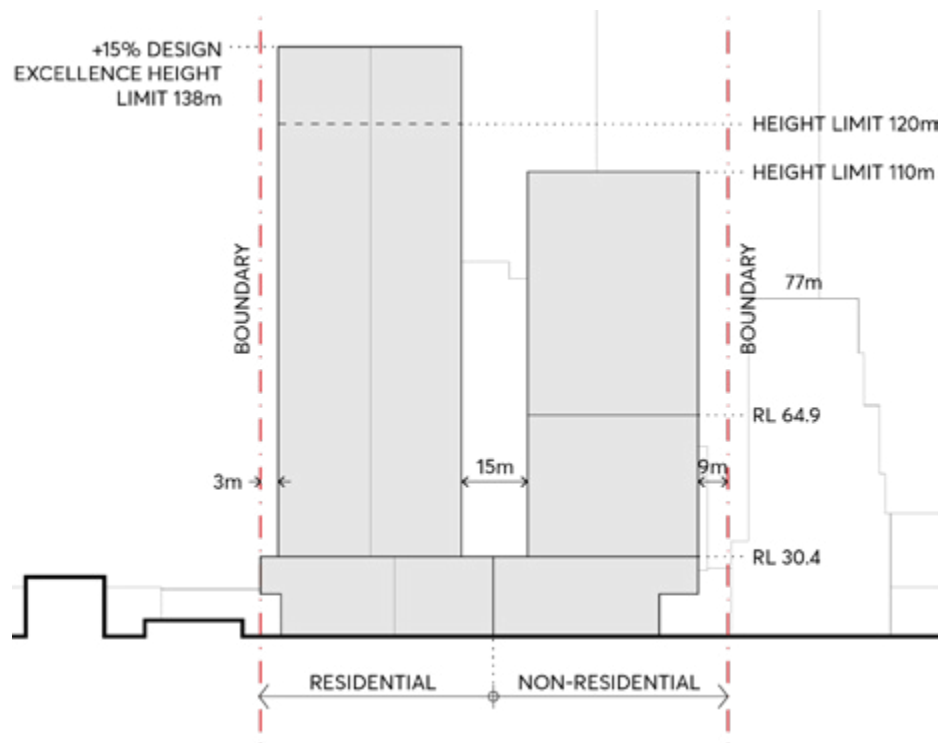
Building envelope Jubilee Park elevation
